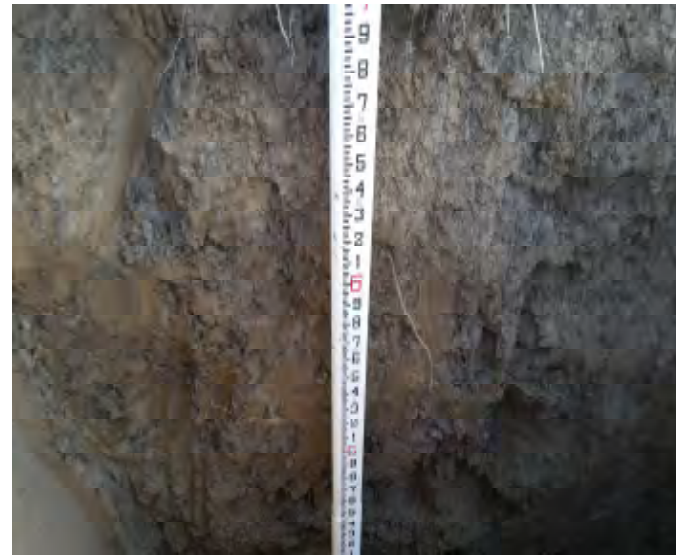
and 2 (Top): Profiles of Test Pit TP-1. Photograph 3 (Bottom Left): Side Profile of Test Pit TP-1.
